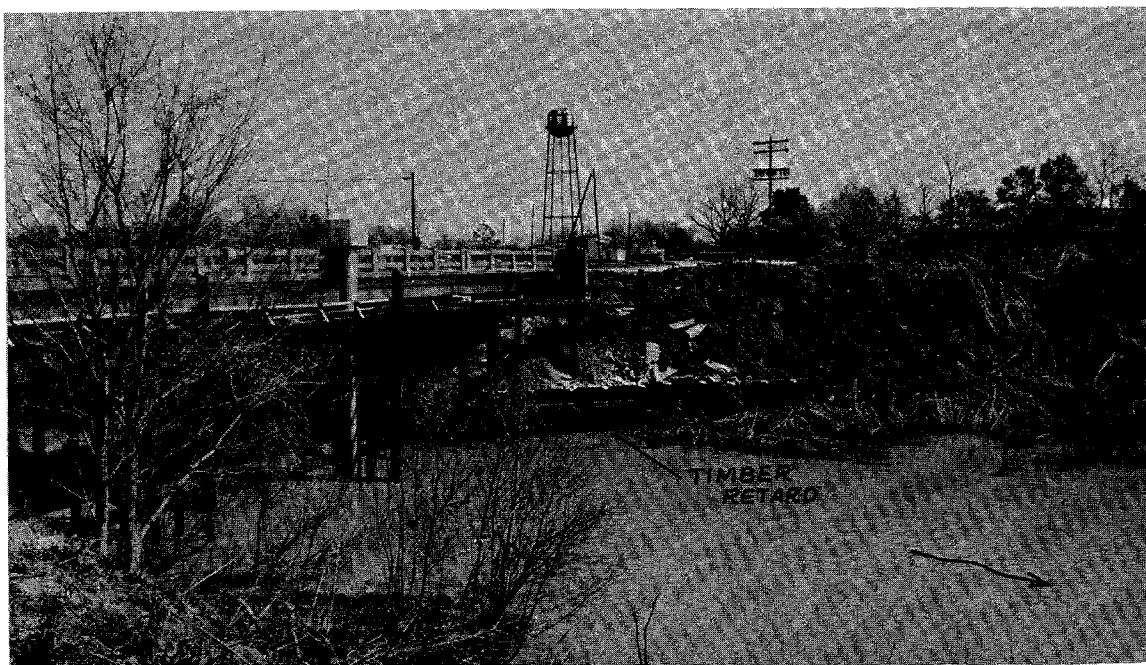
Upstream view of left abutment of SR-114 bridge on March 7, 1977, showing timber retard.
